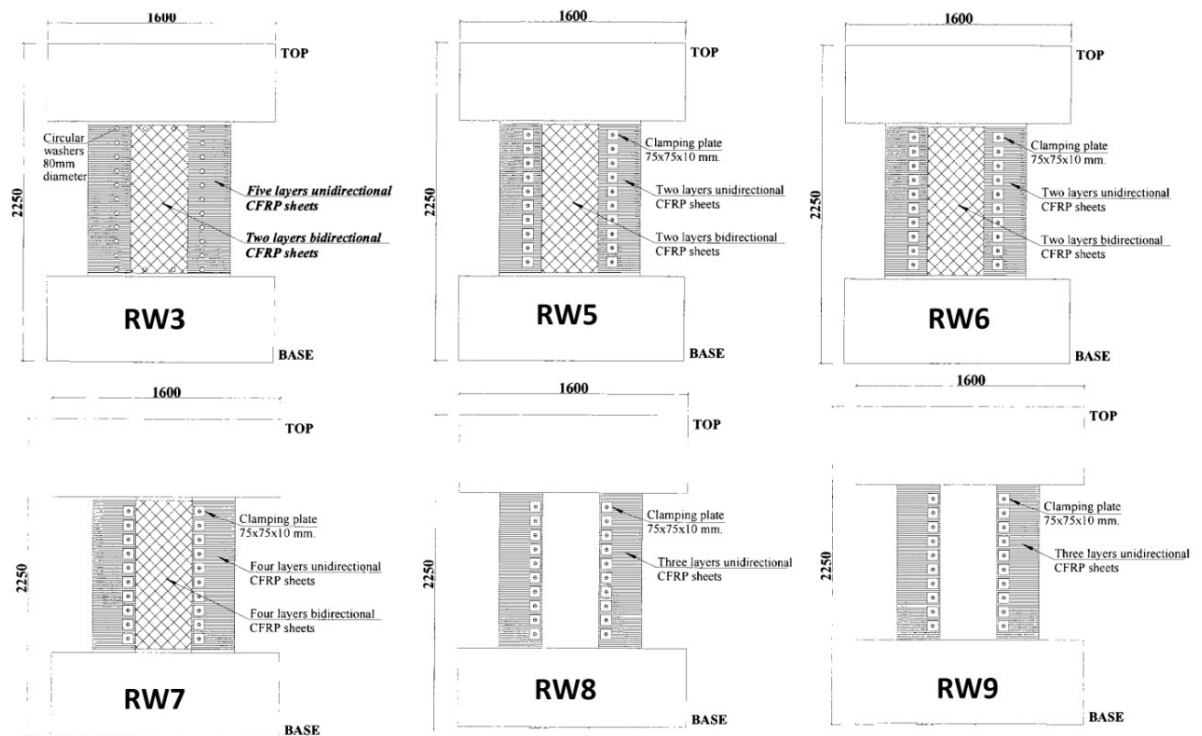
Details of selective specimens tested by Elnady (2008)
